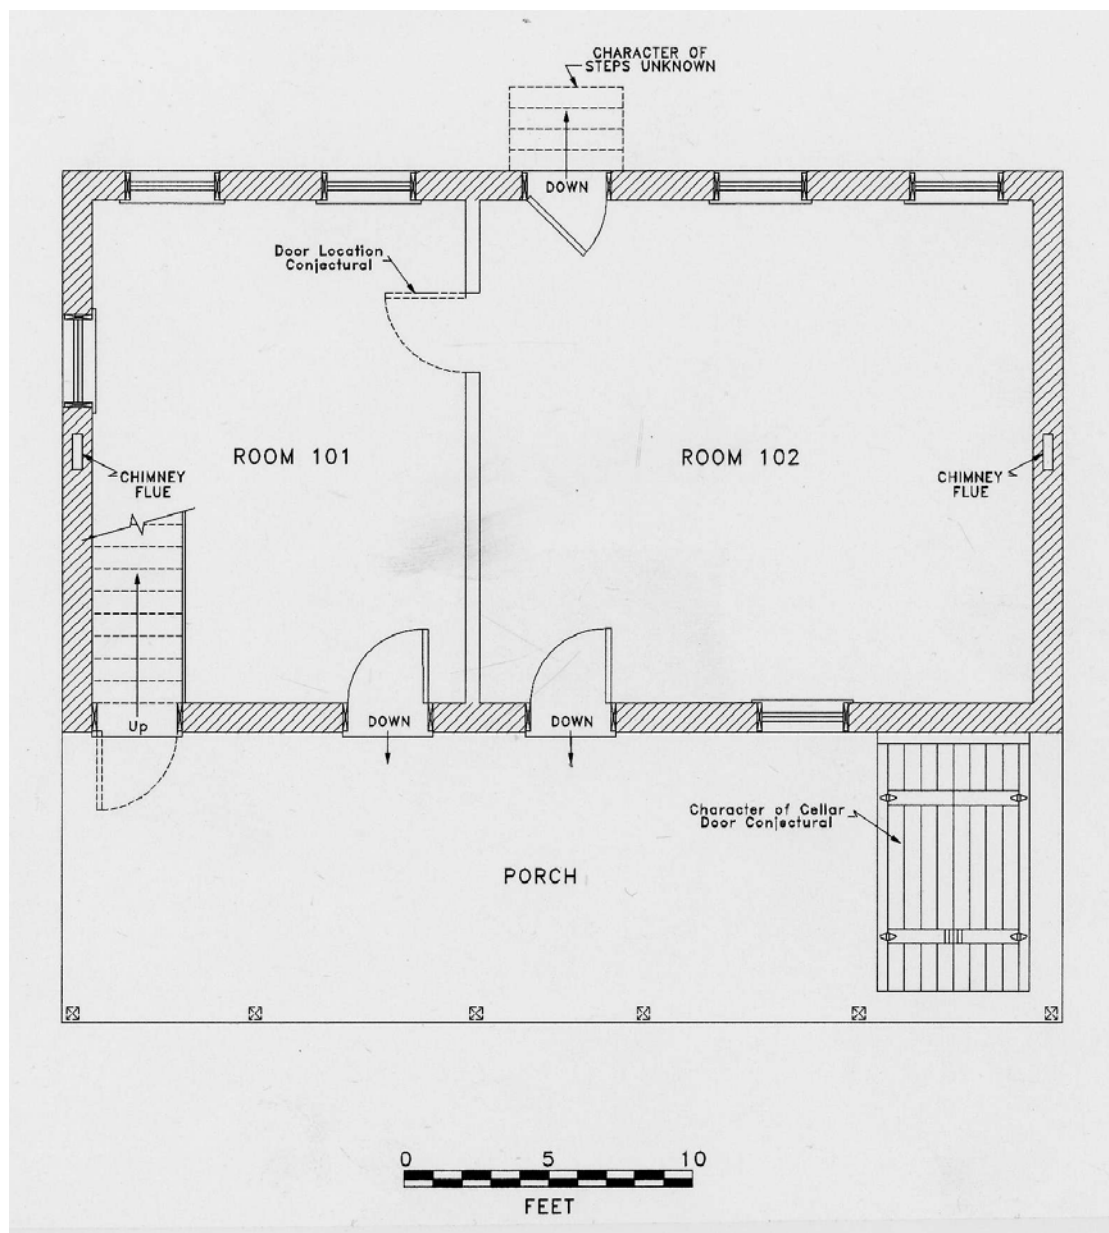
First floor plan of the Valentine House as originally constructed (ca. 1855).
